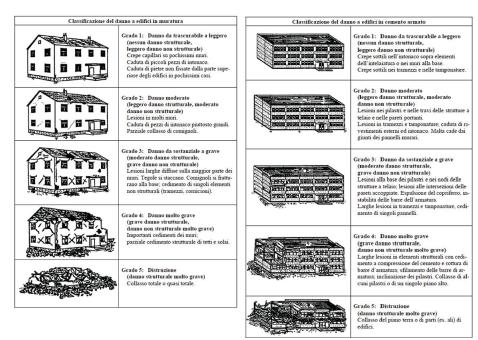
European damage classification scale for masonry buildings (Gruntal, 1998).
